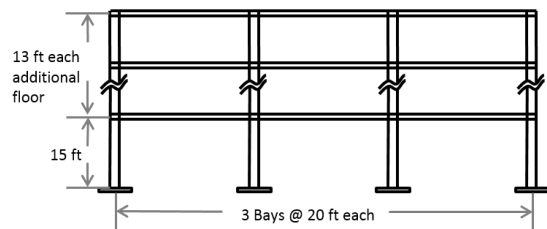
Elevation view for regular buildings *Figure 4-2 –Elevation view for cantilever building
